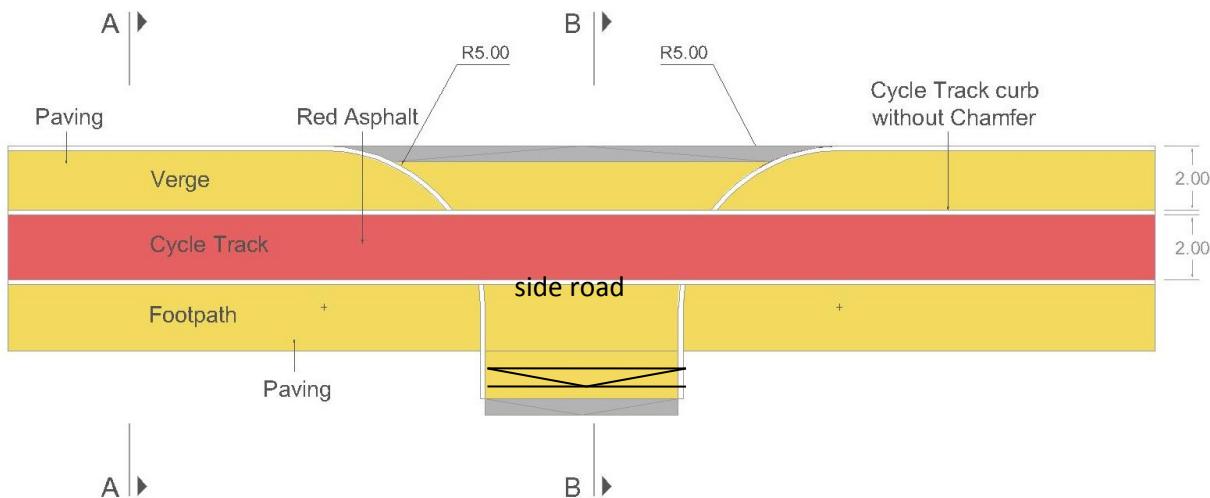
Raised crossing at side road (verge width of 2.00 m.)
